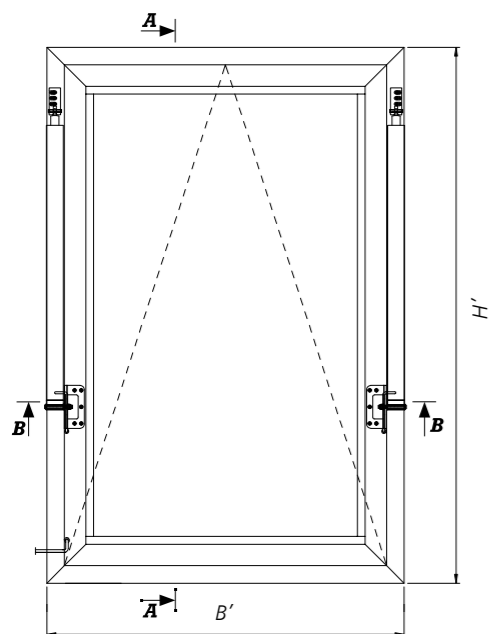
view from inside of the mcr OSO THERM 75 smoke exhaust window with G spindle actuators in closed position
